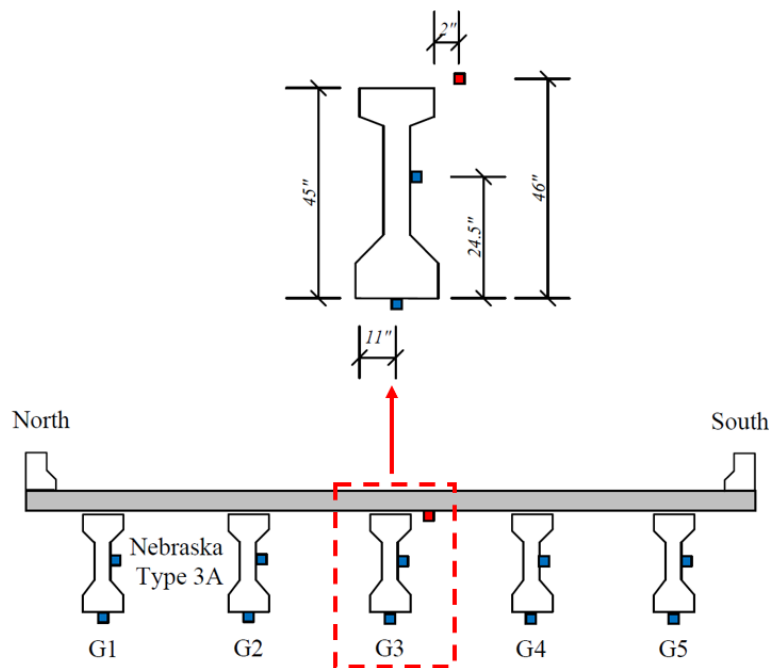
Strain transducers installation locations in the bridge cross-section.
